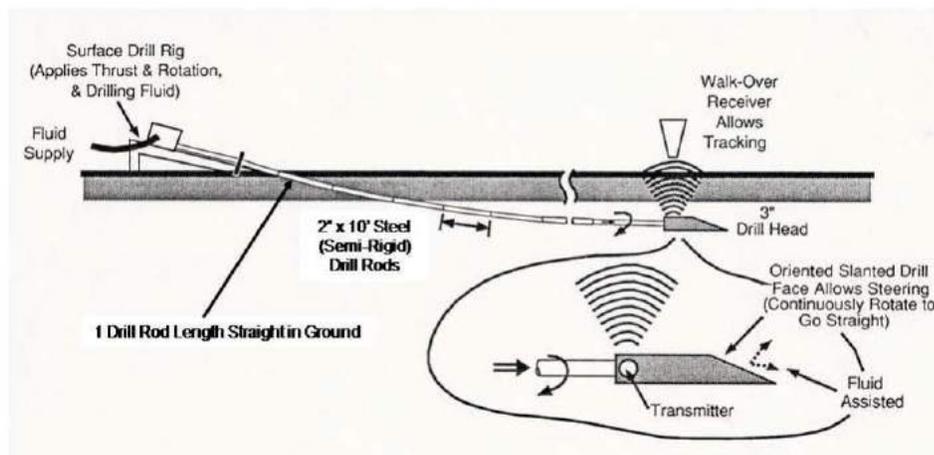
Typical Mini-HDD Equipment and Pilot Boring Process
